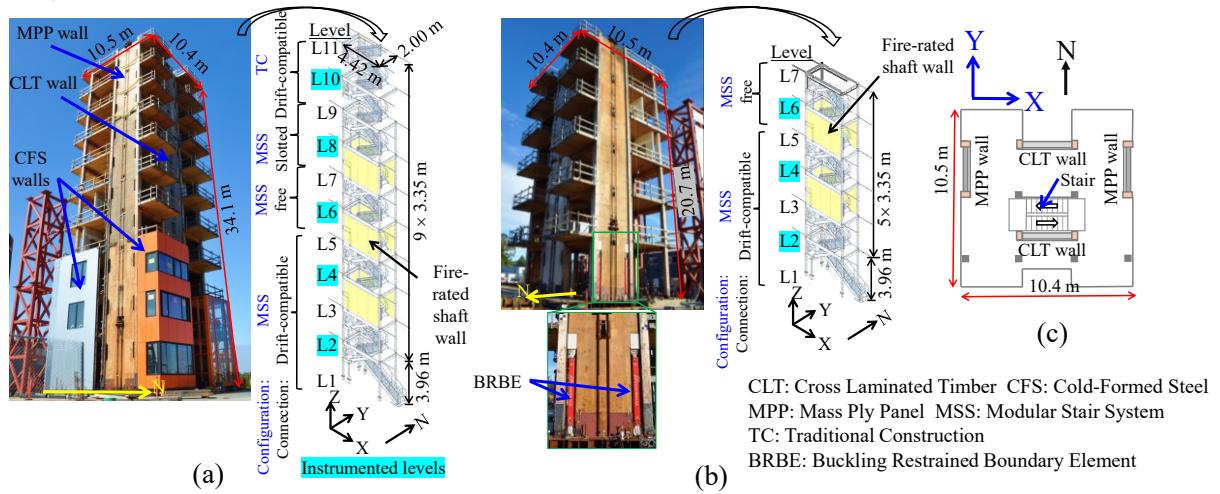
(a) NHERI TallWood building and the 10-story stair tower, (b) NHERI Converging Design building (phase 2: BRBE in Y-direction) and the 6-story stair tower rendering, and (c) floor plan
